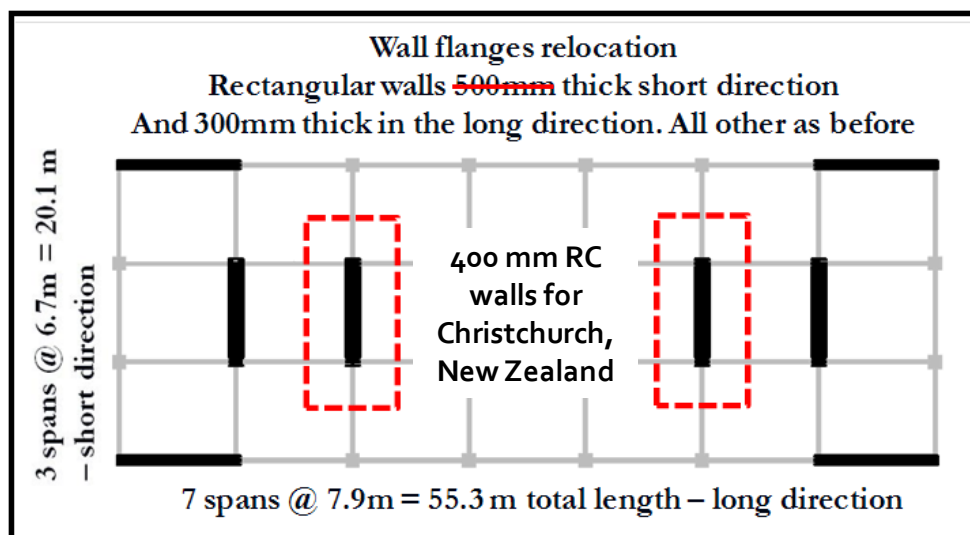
Ideal 12-storey building: the flanges of the original T-shaped walls presented in the companion paper have been relocated into the perimeter leading to rectangular cross section in the highlighted internal walls.
